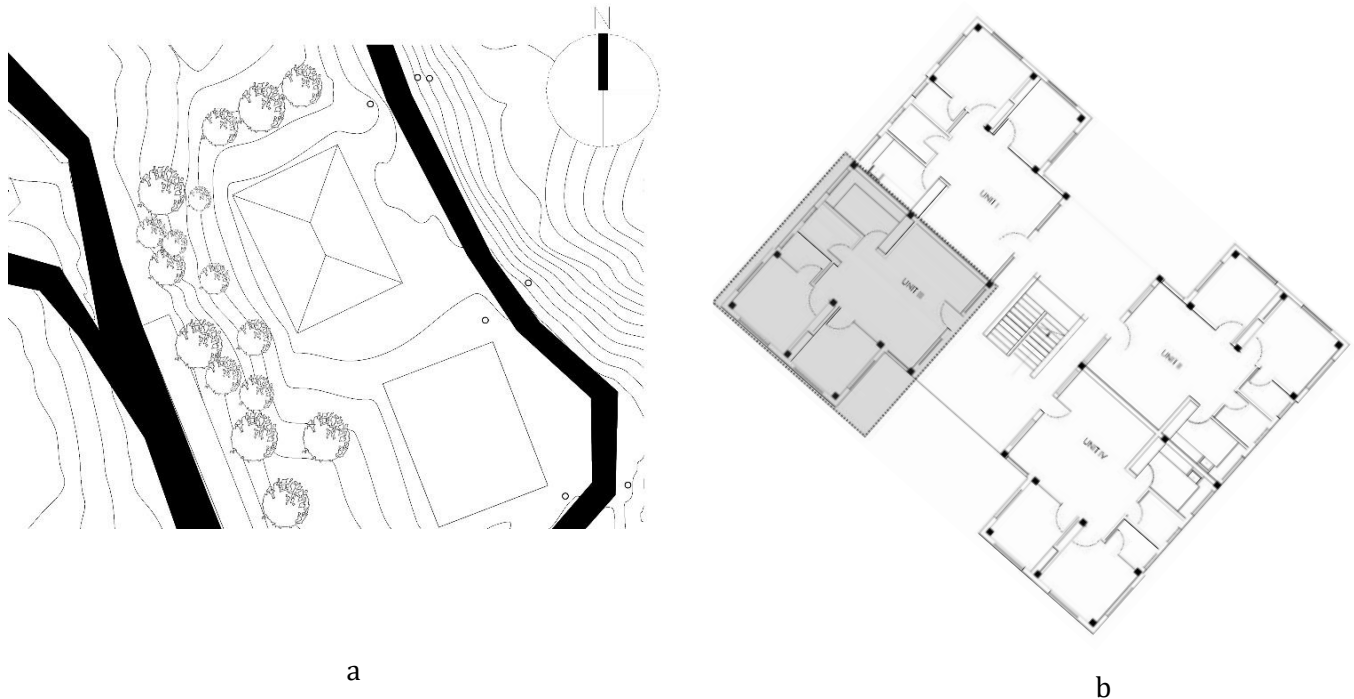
Details of case study building in Phuentsholing Bhutan (a) Site plan of the case building (b) Building layout of the case building.
